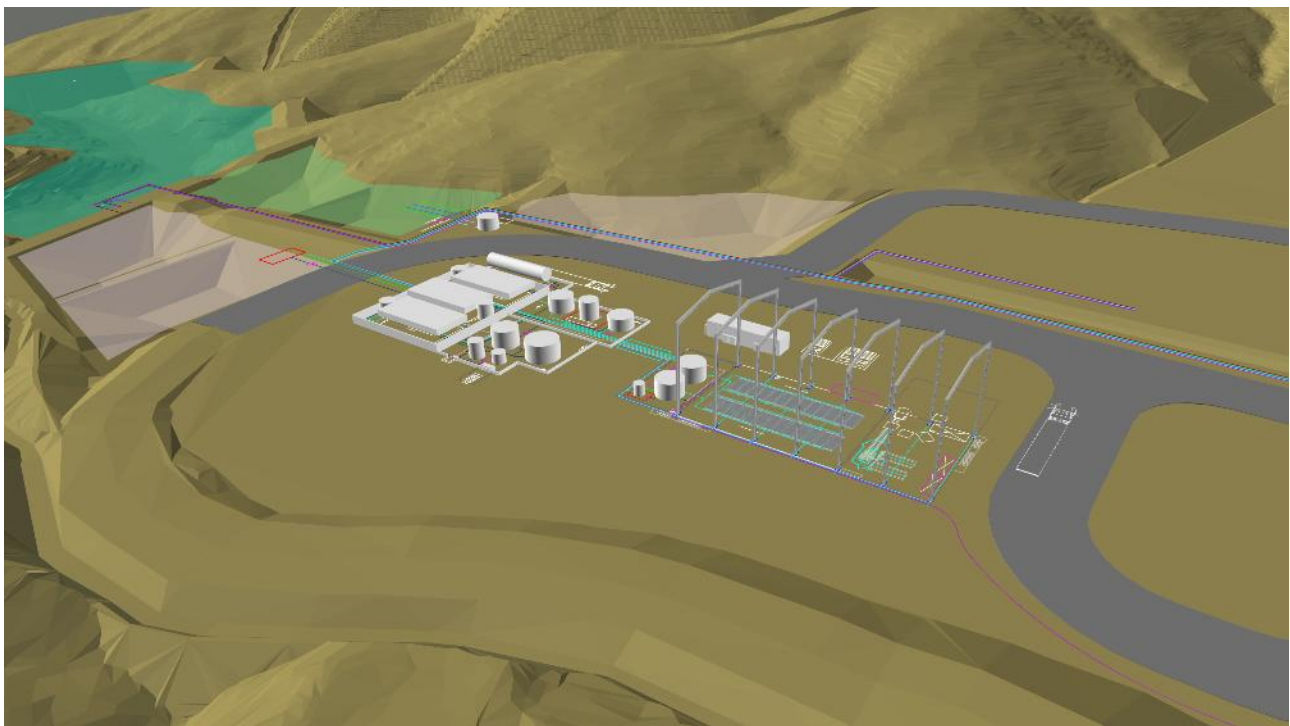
Dianne SX-EW facility design and area layout (design images, construction not yet completed)
